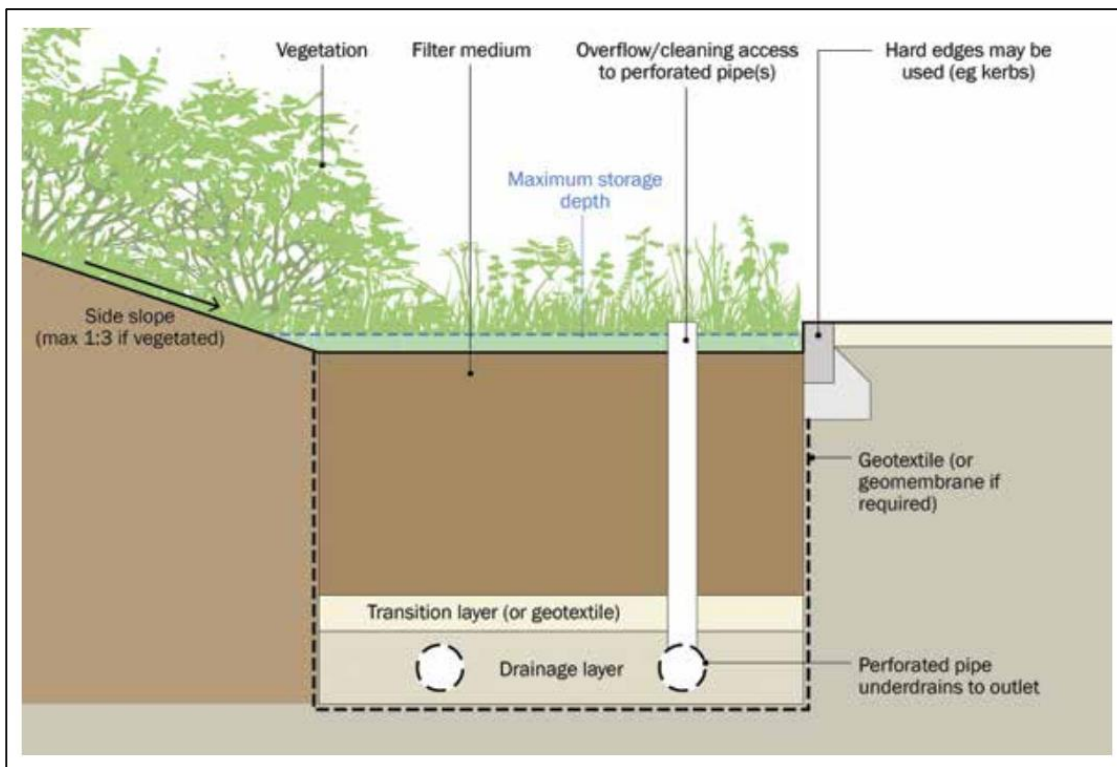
Typical cross-section detail of a bio-retention system (Source: CIRIA SuDS Manual)
